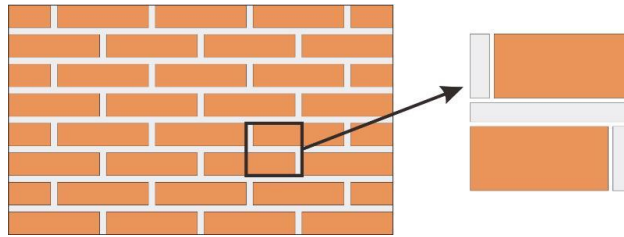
Modeling Masonry Wall using Micro-Modeling Concept is Unnecessary
